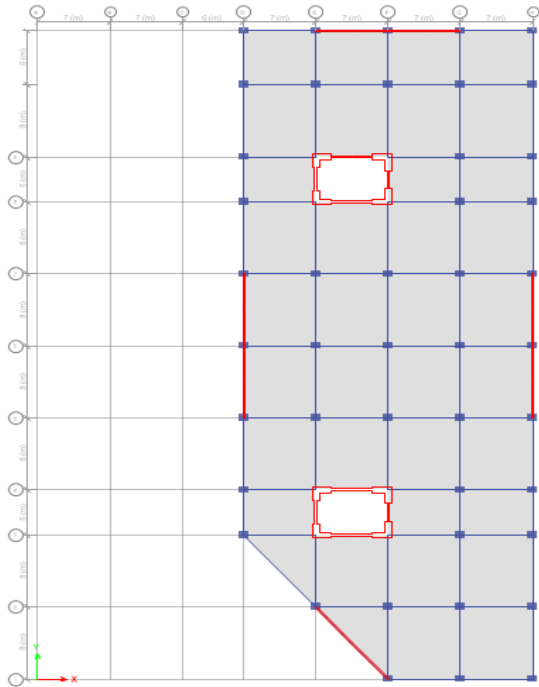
Typical Floor Plan: from 13 to 21 story level : Shear wall At middle portion
